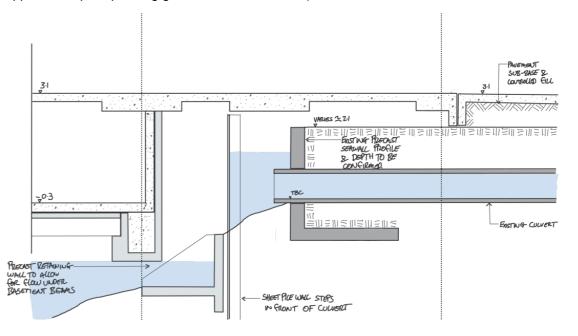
Typical Section Through Culvert that discharges centrally into the facility
